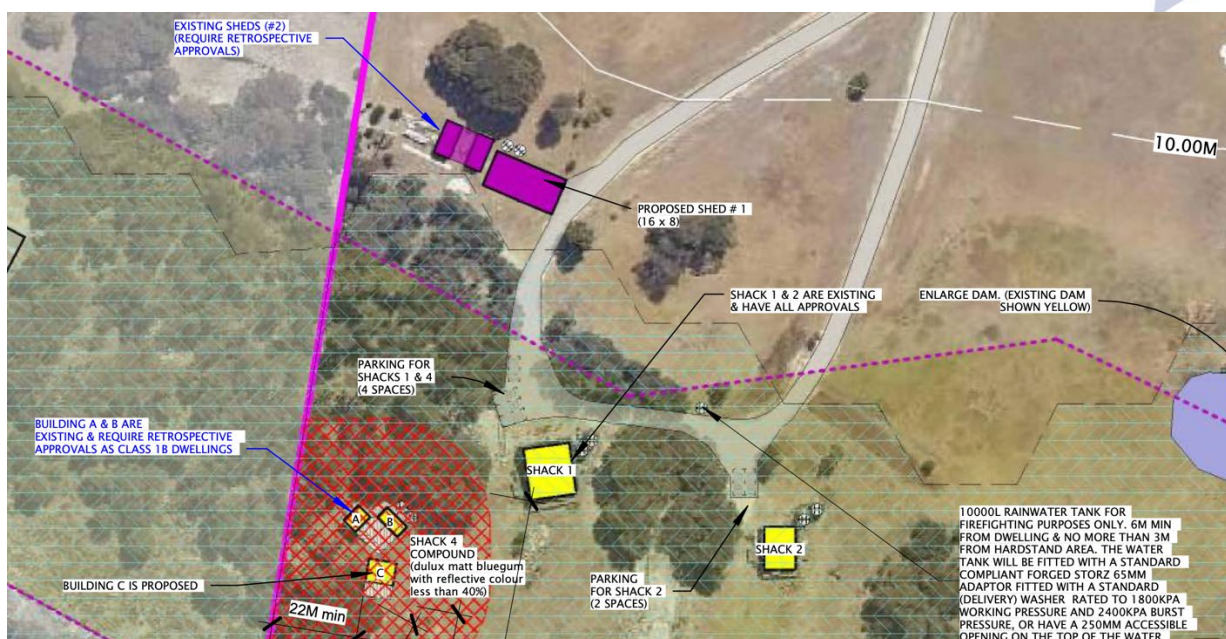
Proposed site plan detail showing buildings that require retrospective approval- blue text blue arrows.
